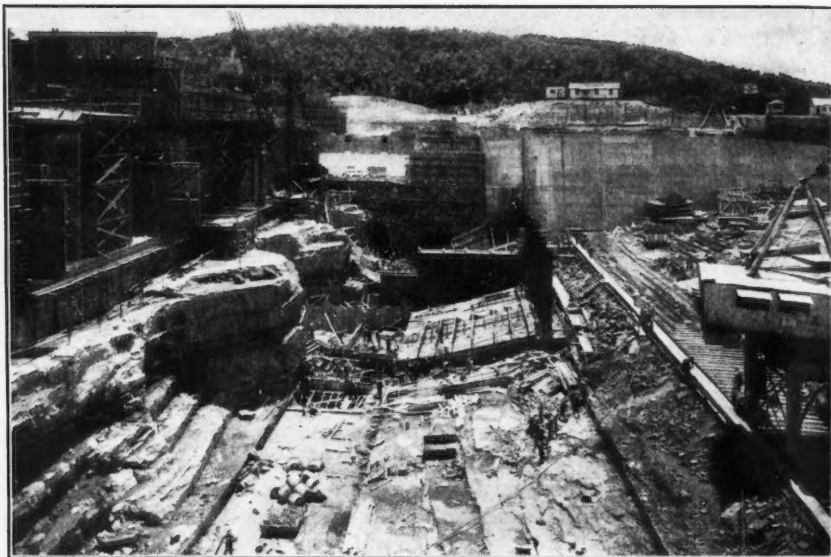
FACING SOUTH FROM THE SOUTH SPILLWAY TRAINING WALL, SHOWING POWER-HOUSE EXCAVATION
